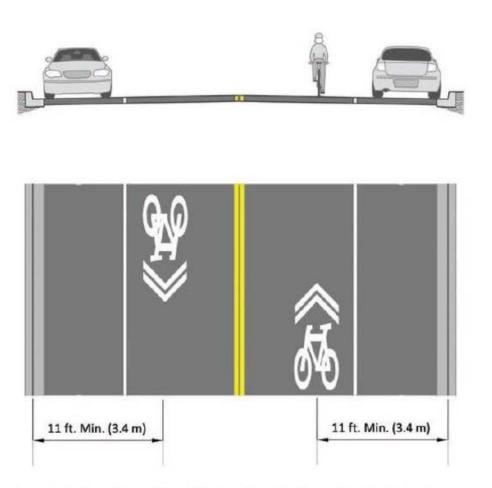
Typical Shared-Lane Marking Cross Section on Street with Parking
